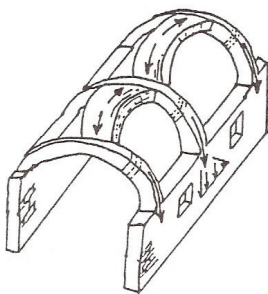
Vault and vault rib structural system, structural solution to transform force concentration away from openings by arches
